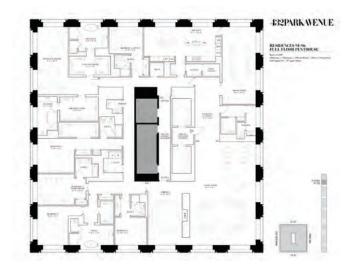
Full Floor Penthouse Floor Plan of 432 Park Avenue (Source: CIM Group & Macklowe Properties).
